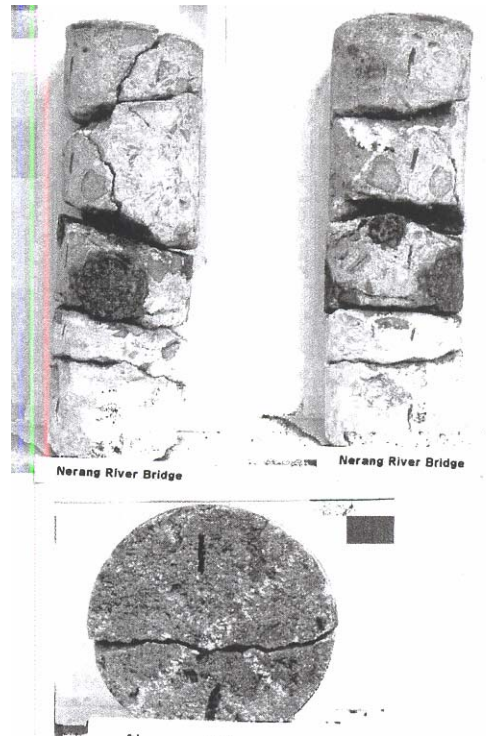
Concrete core sample from Nerang River Bridge (note the severity of cracking)
